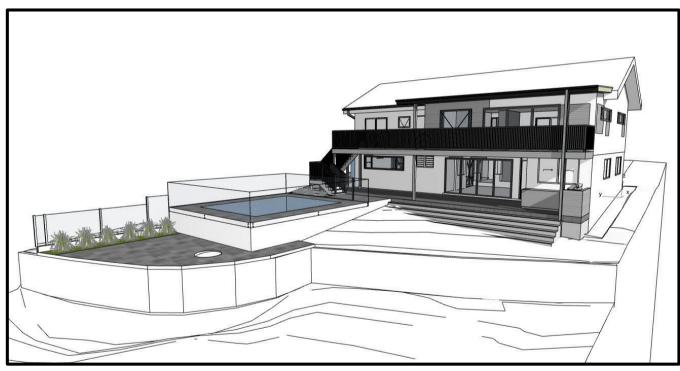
Proposed works at No. 122 Parkes Road in grey. (Action Plans 2019).
